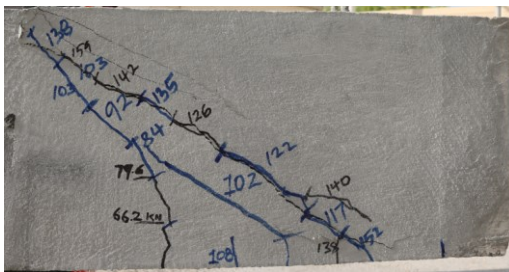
Crack patterns and failure modes for Specimen P-I.
